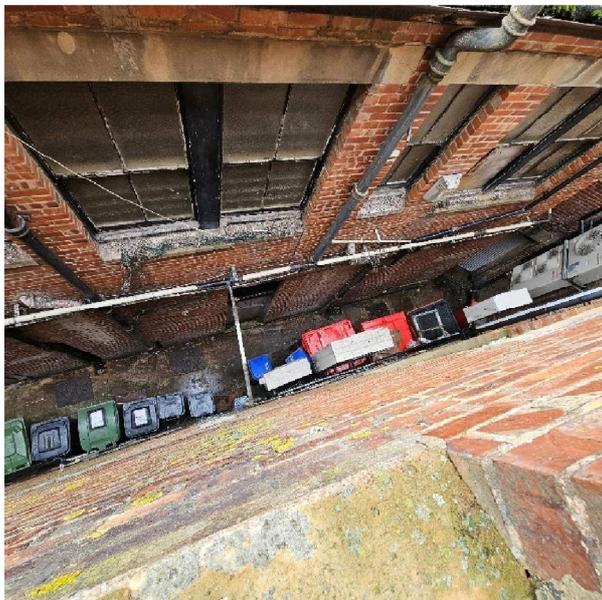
the alley to the west side of the building is currently used as location for refuse storage
